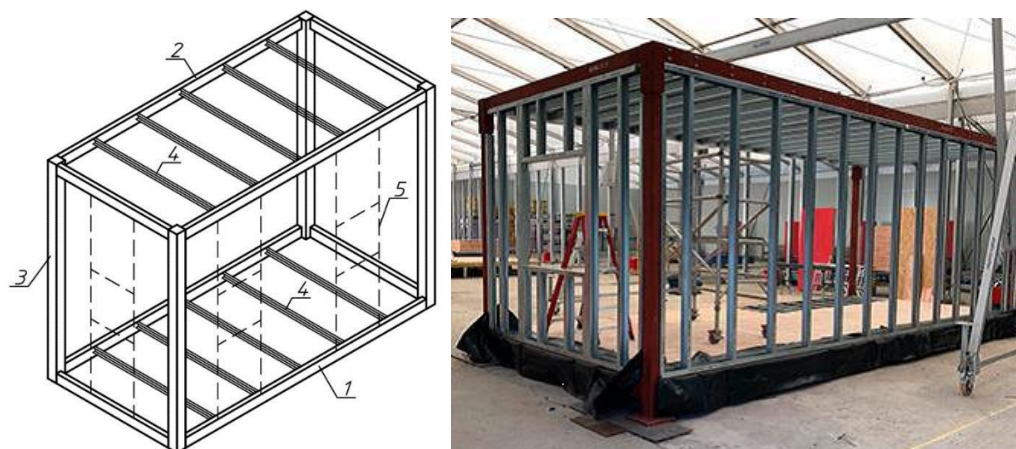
Typical frame of the module with support columns: 1 — lower horizontal frame; 2 — upper horizontal frame; 3 — column; 4- flooring beams; 5 — wall fence (if necessary).
